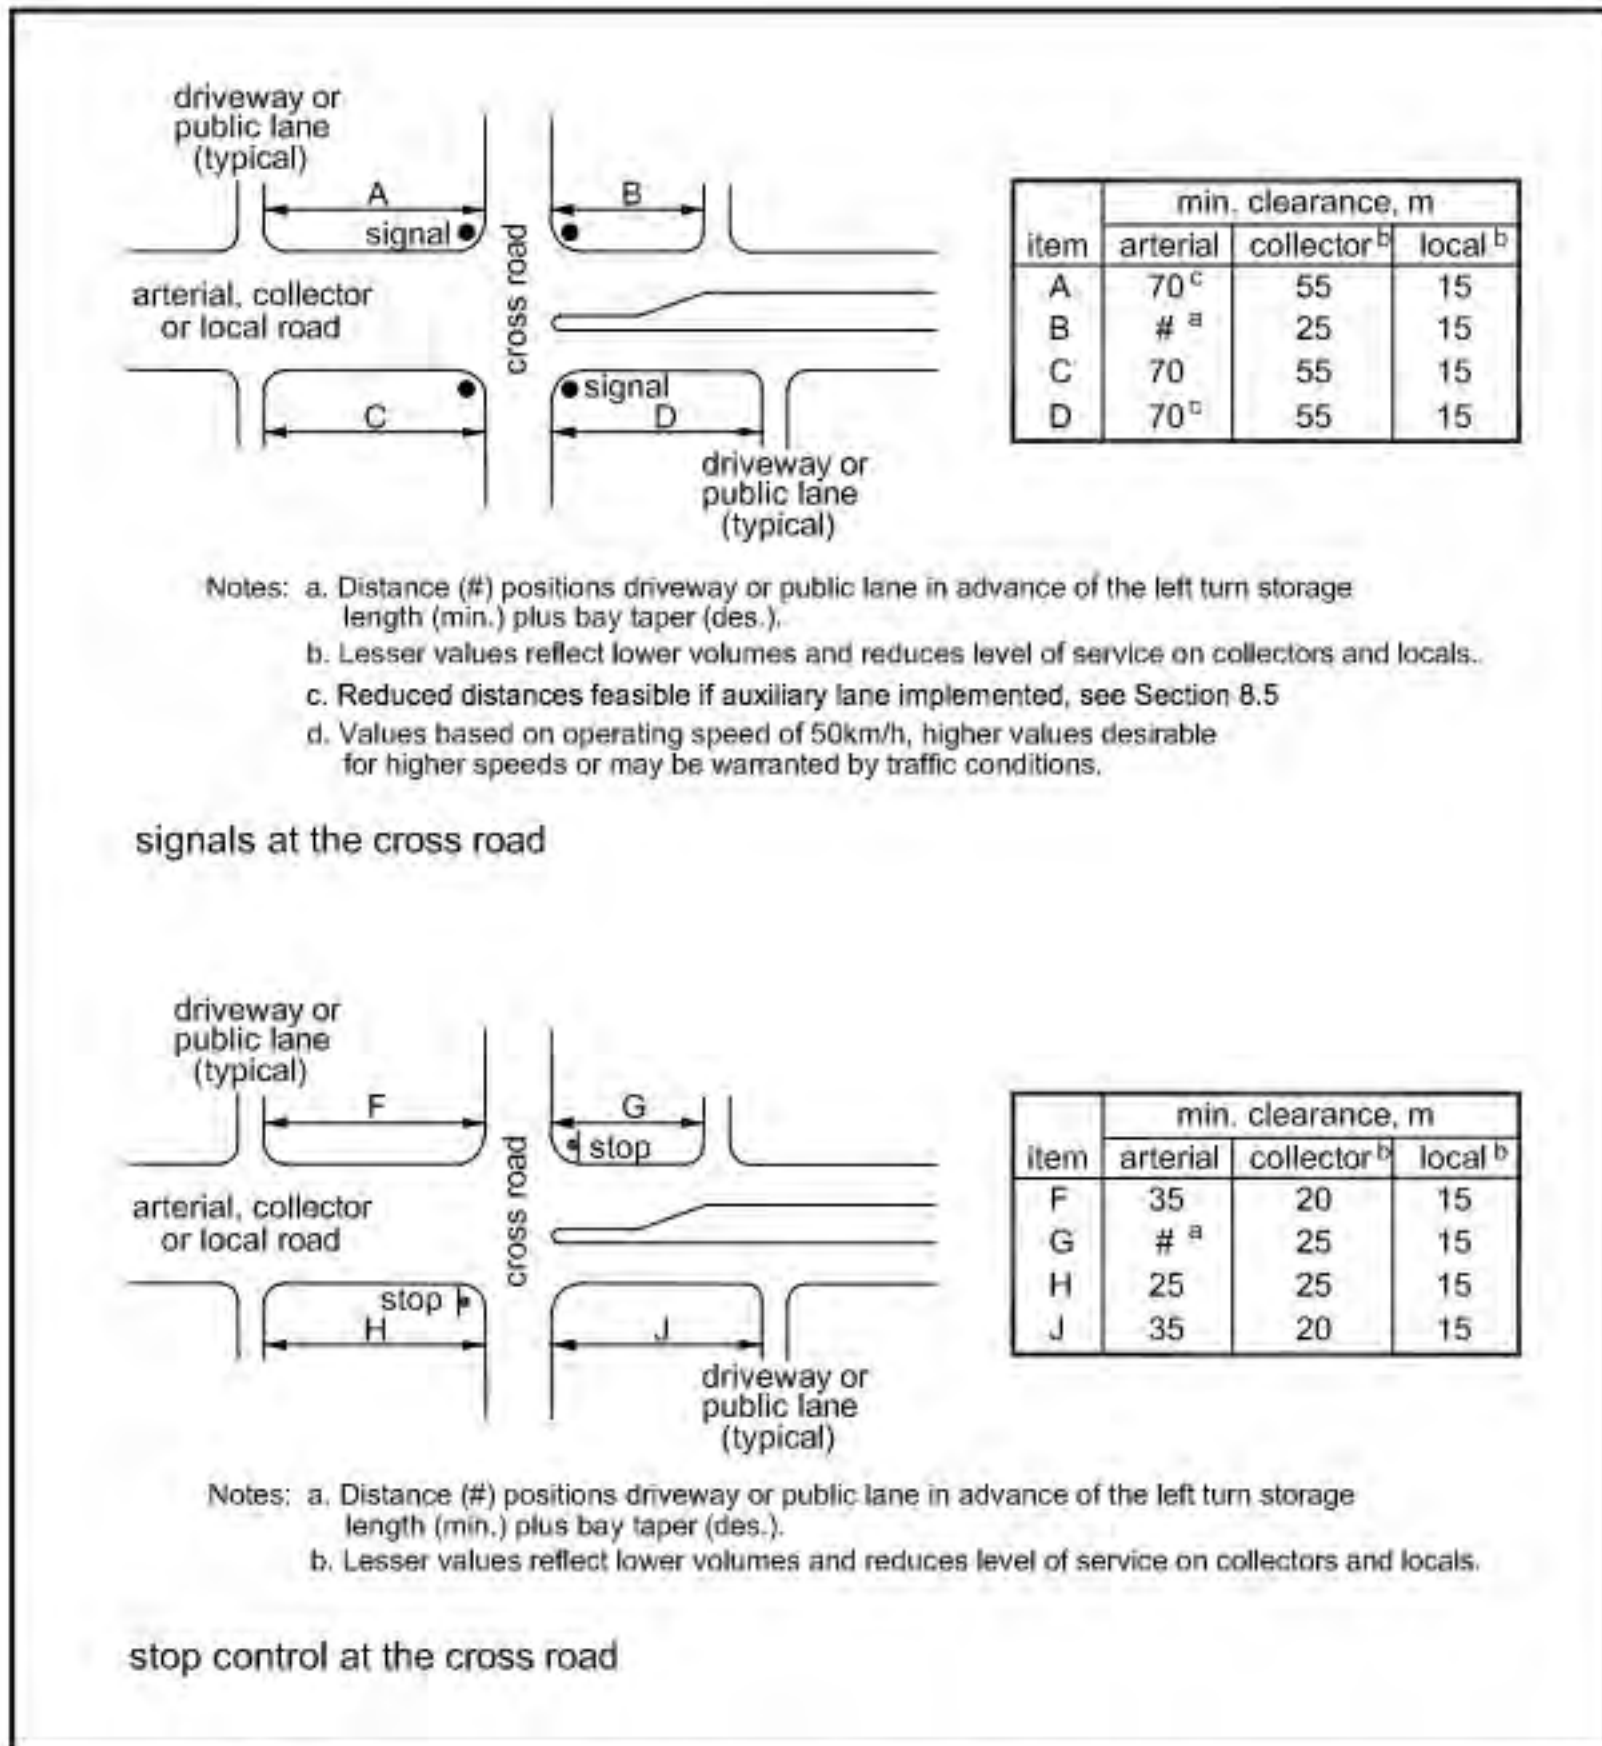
Suggested Minimum Corner Clearances to Accesses or Public Lanes at Major Intersections
